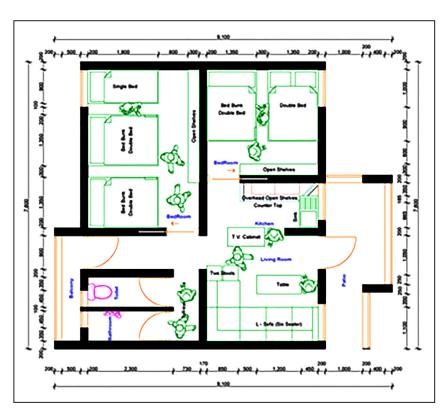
One-bedroom house floor layout plan Source: Author's construct 2018
